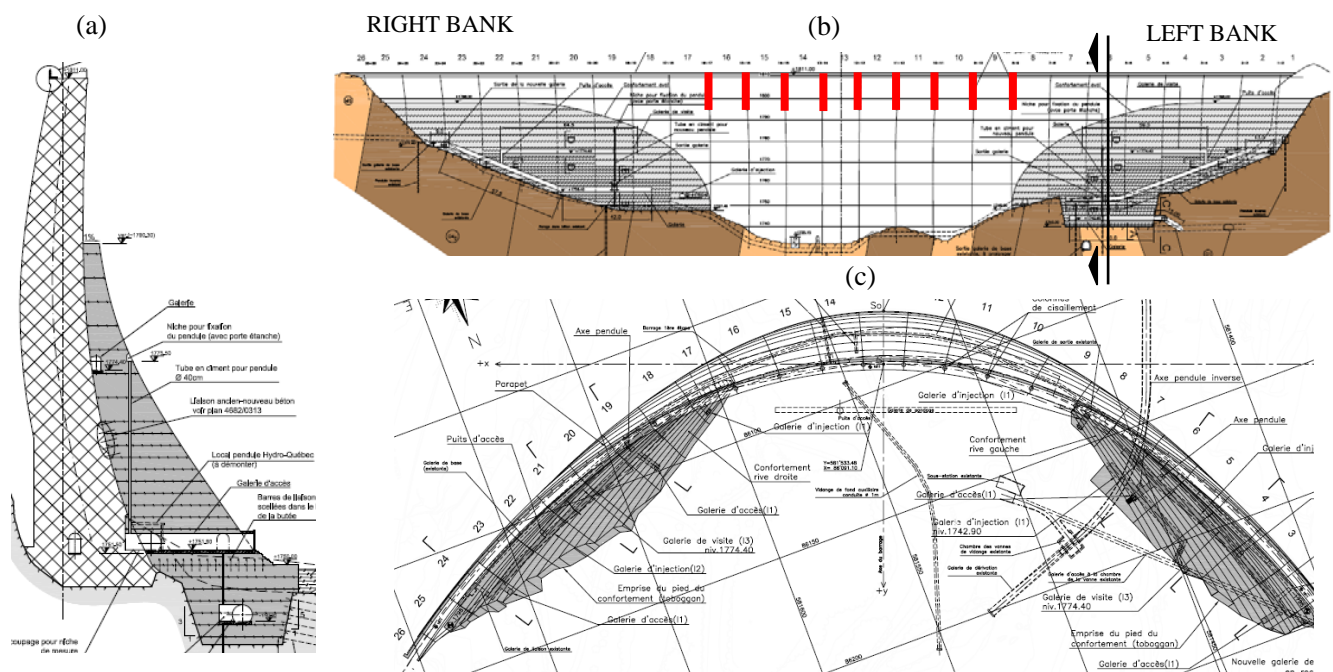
Final strengthening alternative of Les Toules arch dam, (a) Vertical Section, (b) Developed Downstream Elevation, (c) Situation
